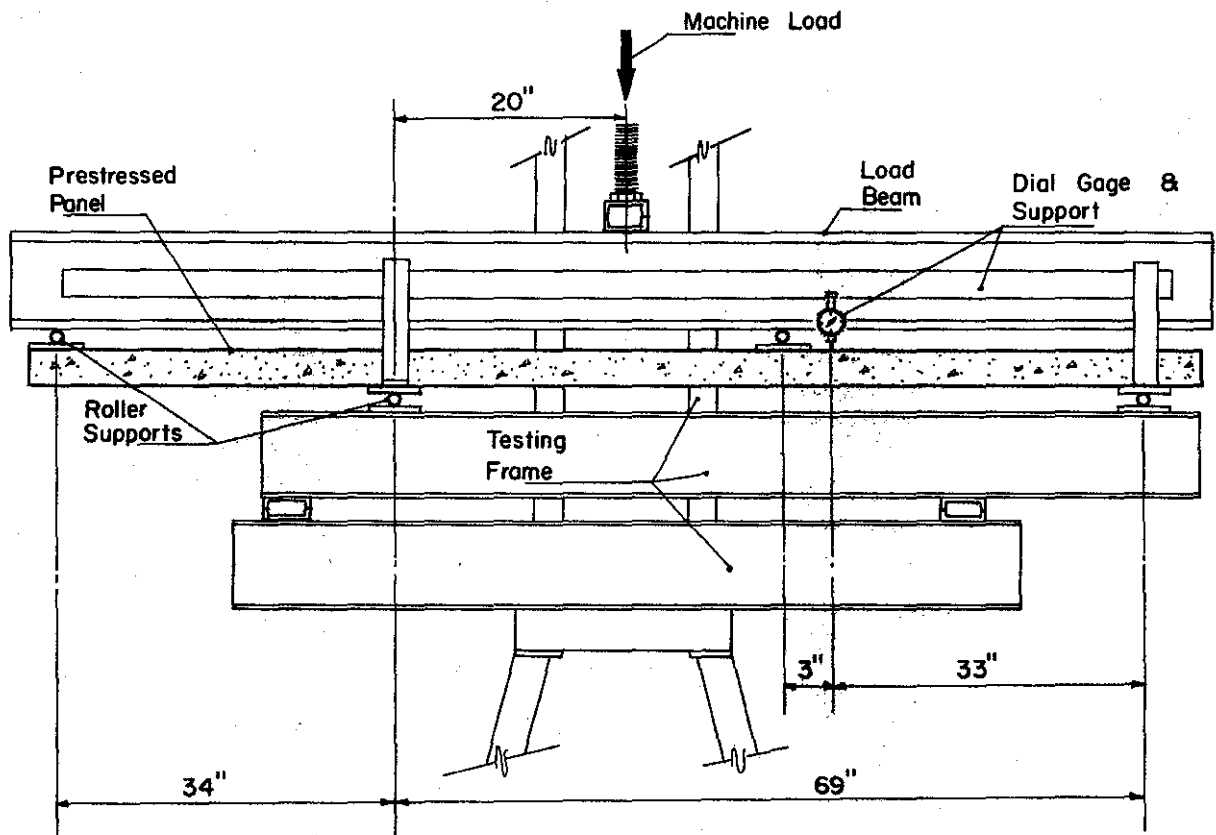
TEST SETUP FOR FATIGUE LOADING OF 108 IN. LONG PANELS
